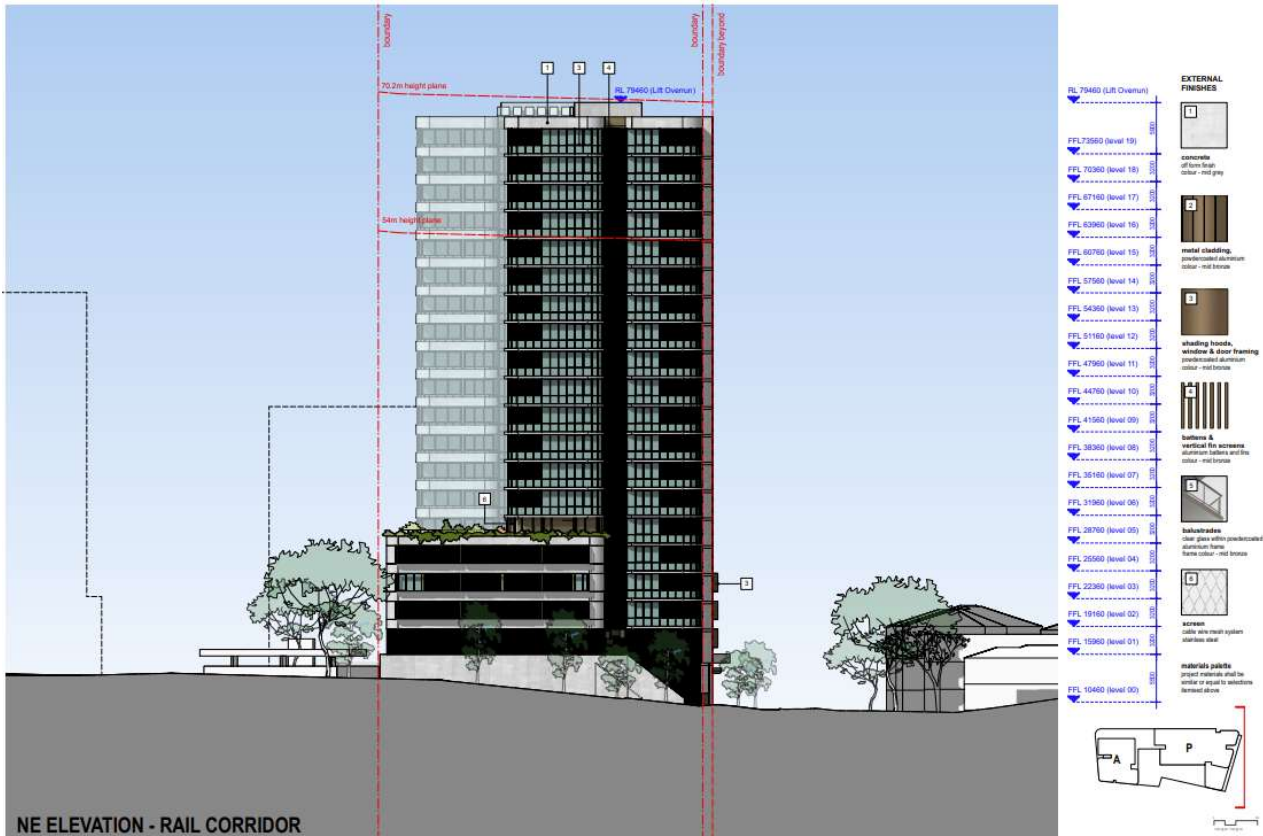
Extract of the proposed north east elevation to the rail corridor.
